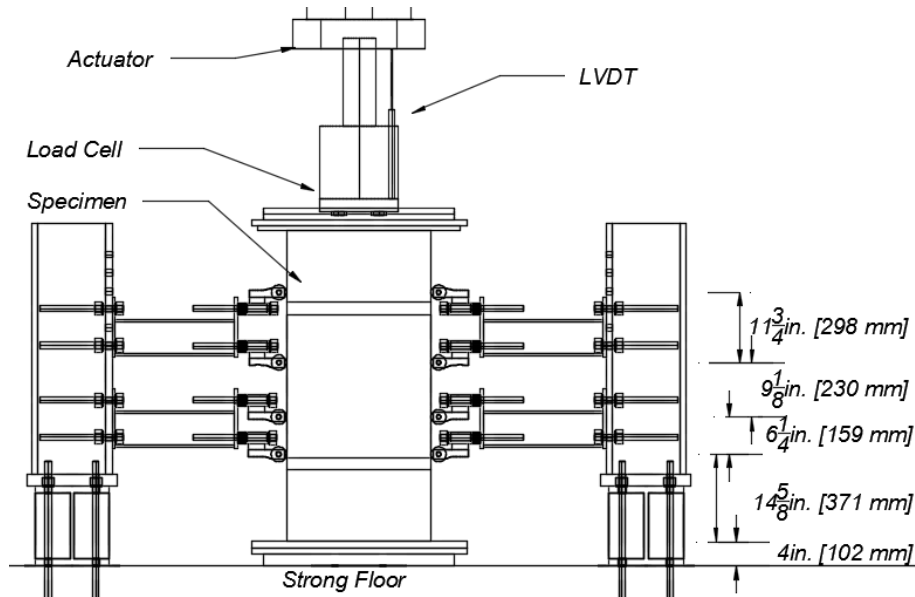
Front view elevation of the specimens containing #5 (#16M) reinforcing bars across the interface
